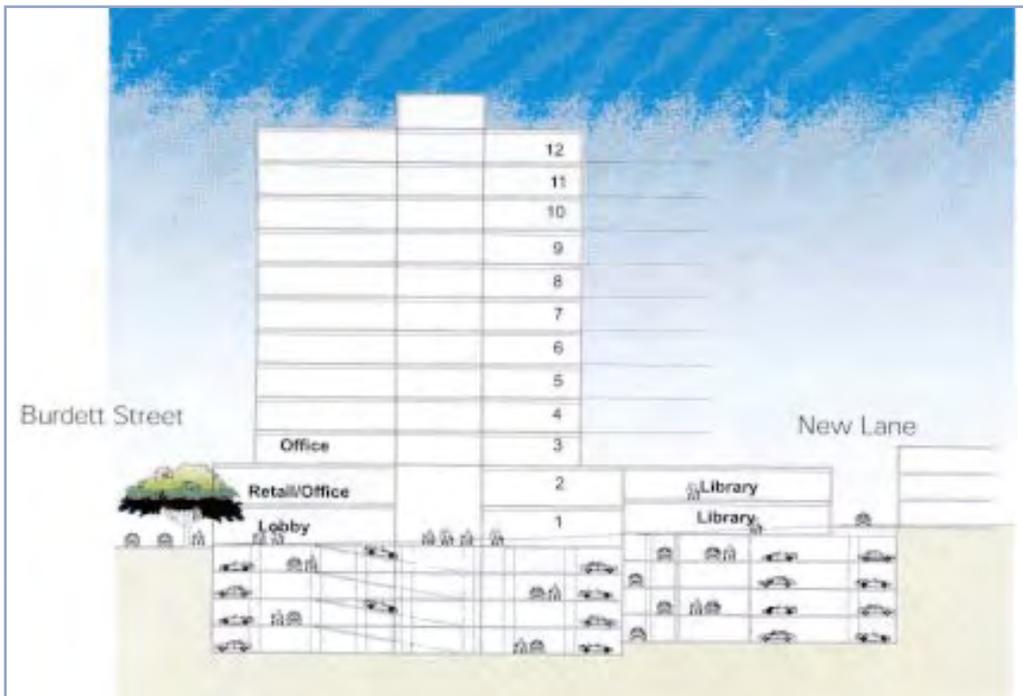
(y): East Precinct public car parking concept plan - redevelopment of Site C.(E)
